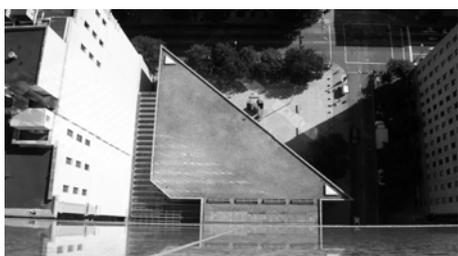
Before Green Roof Installation - SunTrust Mid-Atlantic
